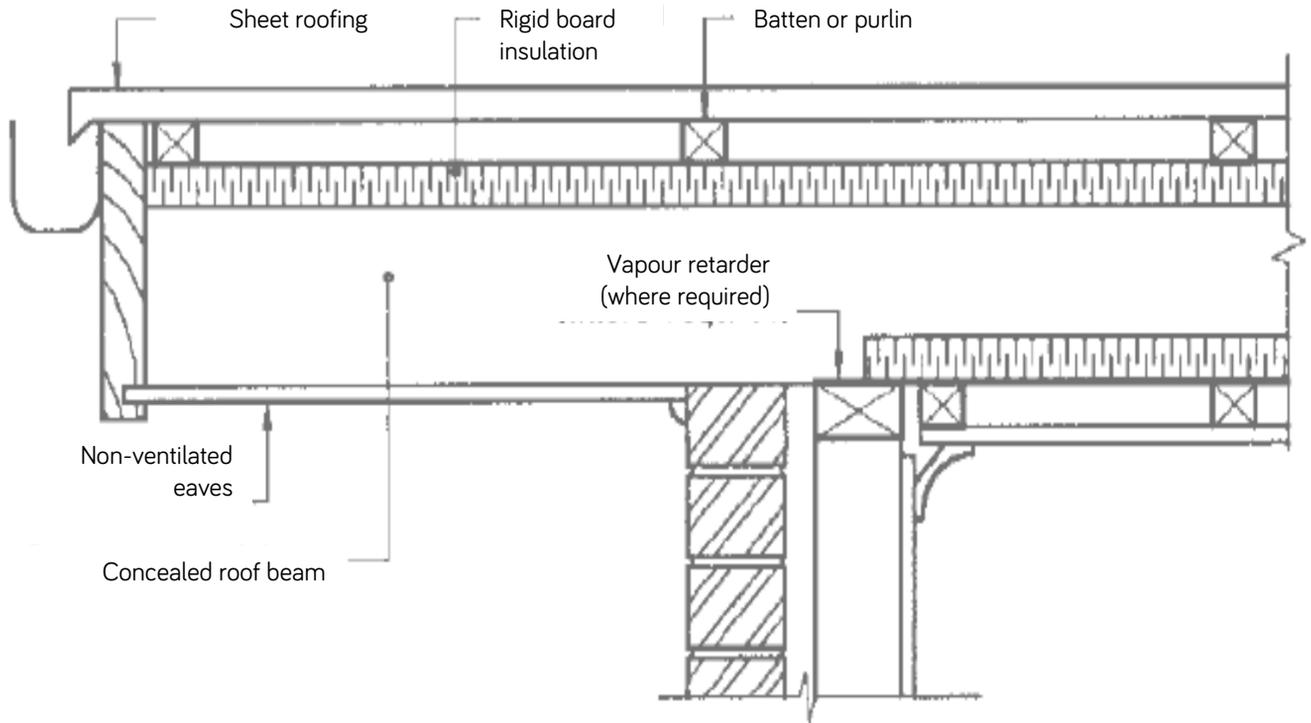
Rigid board insulation beneath battens and on ceiling / Insulation of horizontal ceilings with flat or low pitched metal roofs.
